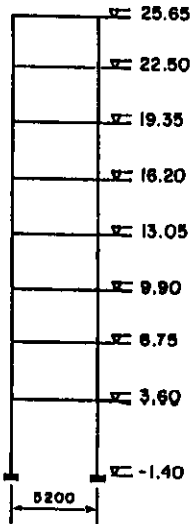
SCHEMATIC PLAN OF THE INSTITUTIONAL BUILDING
